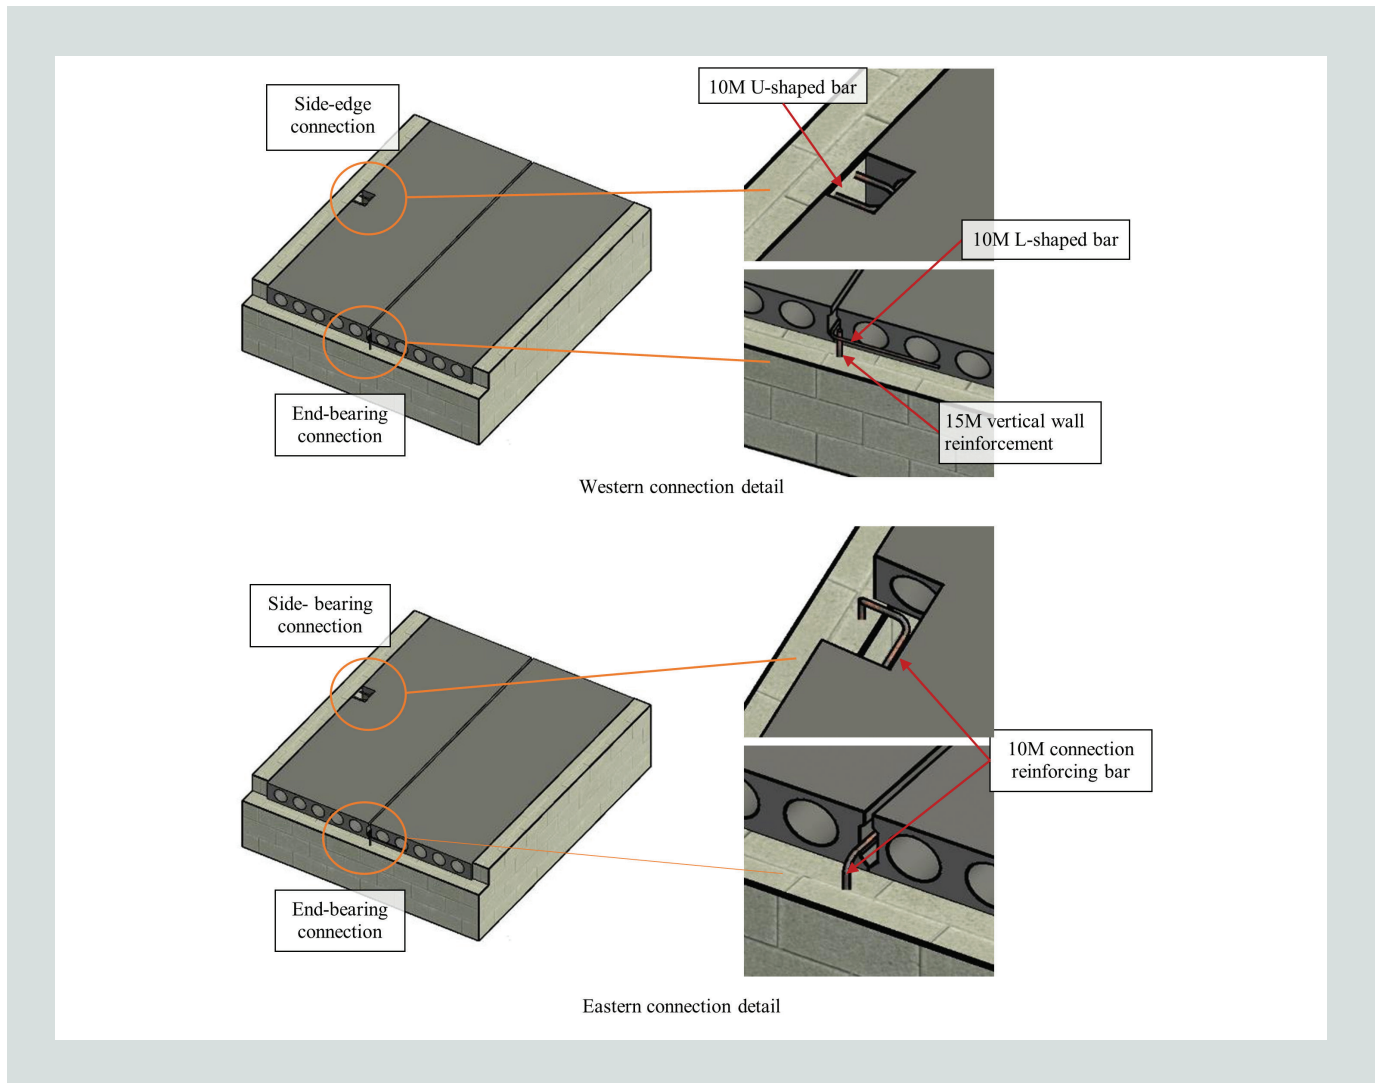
Canadian end- and side-connection details before grouting. Note: 10M = no. 3; 15M = no. 5.
